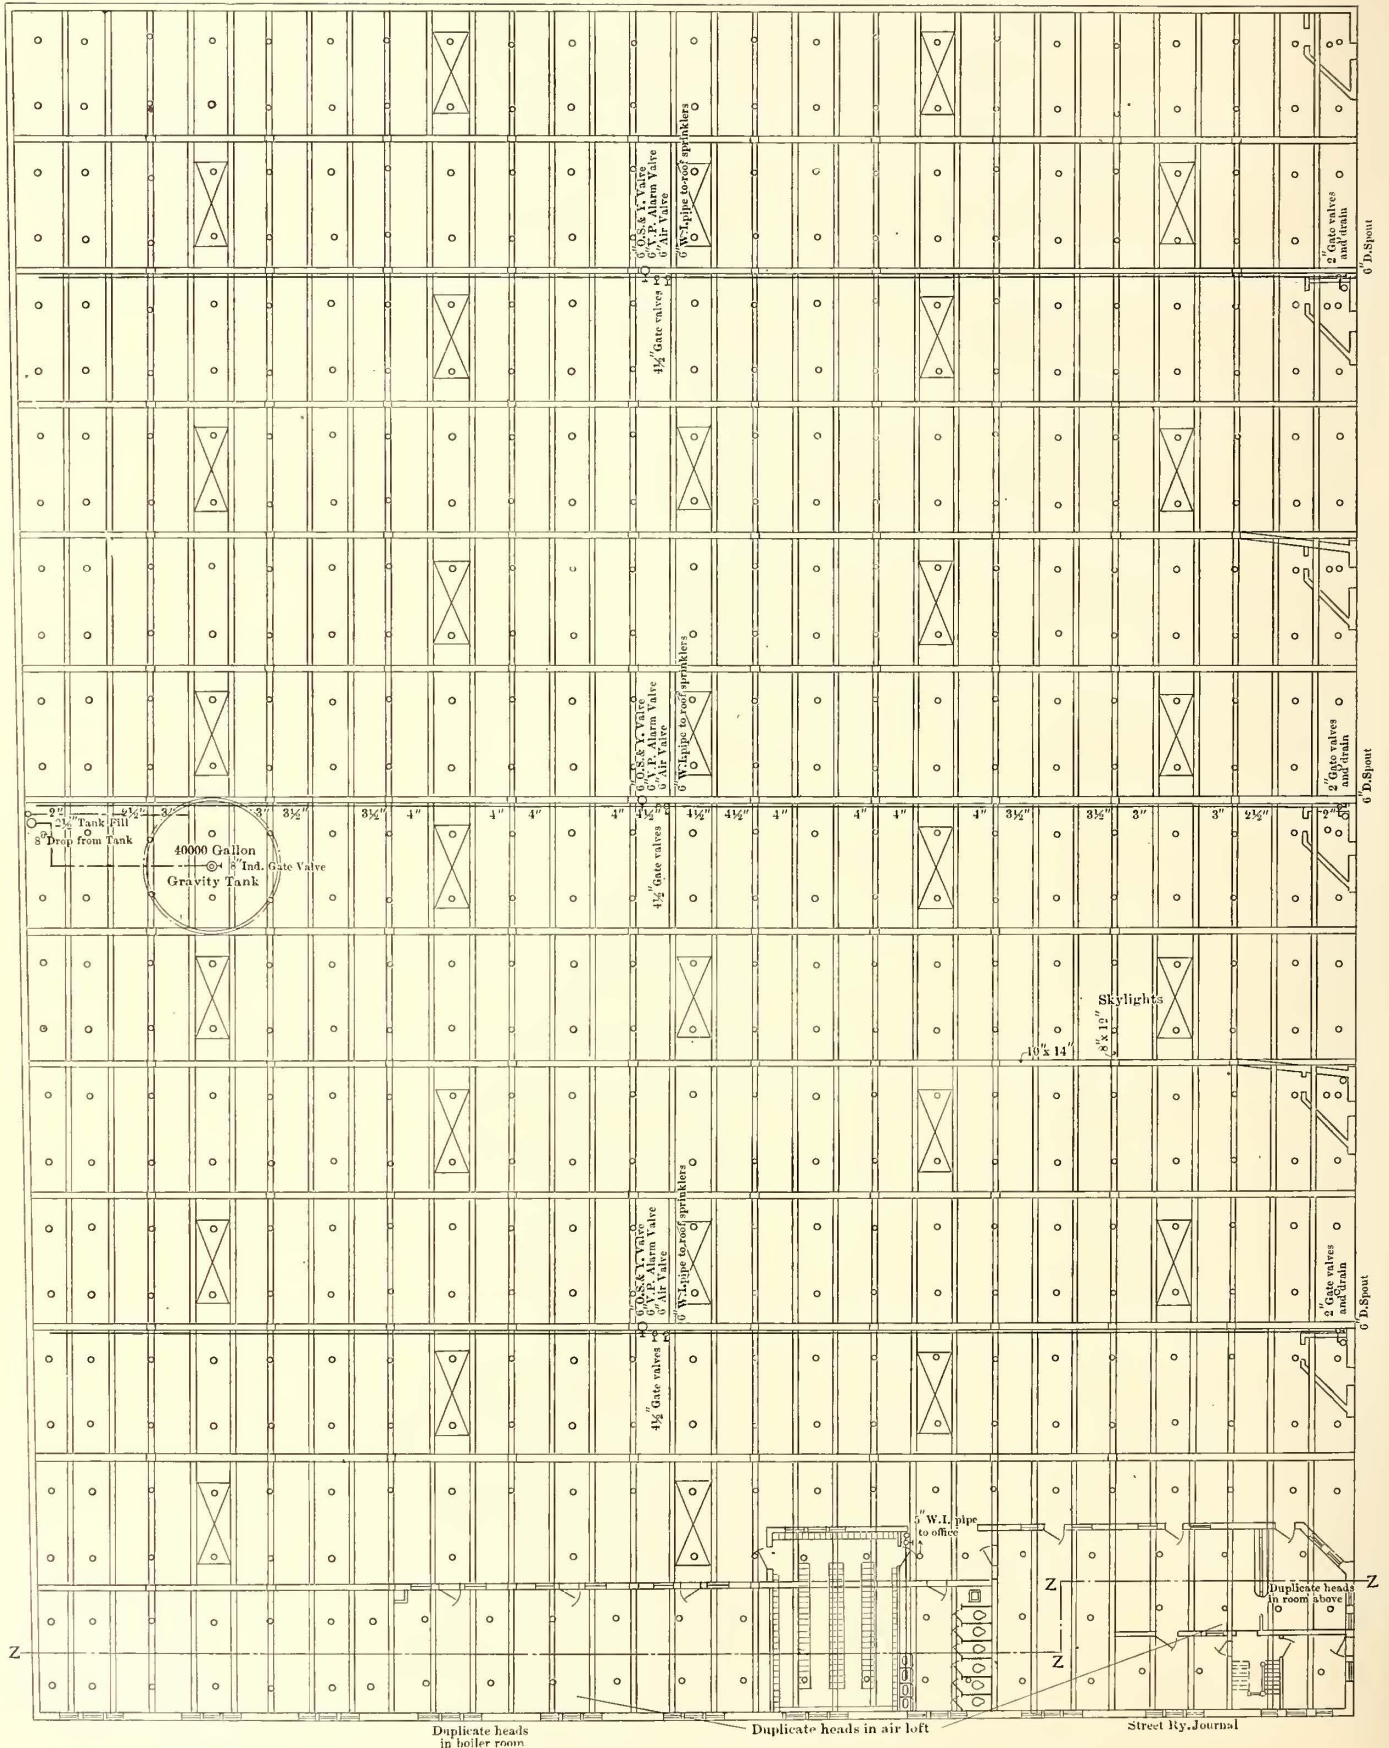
PLAN OF EDMONDSON AVENUE CAR HOUSE, SHOWING LOCATION OF ROOF SPRINKLERS
